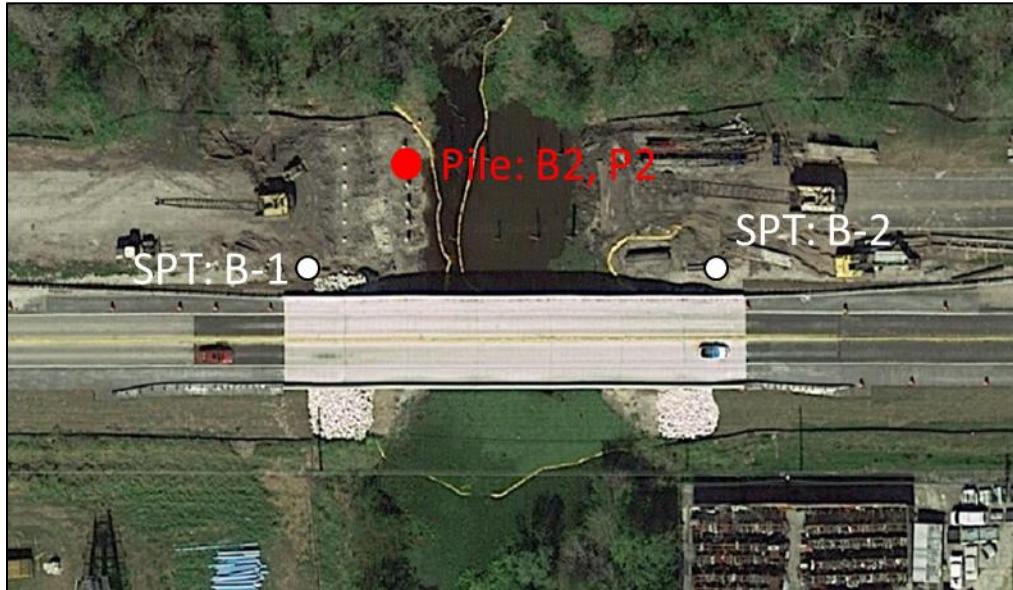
Test pile and SPT boring locations for S.R. 600 over Saddle Creek
